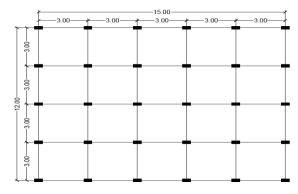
Plan of the building used for analysis purpose with its column orientation
